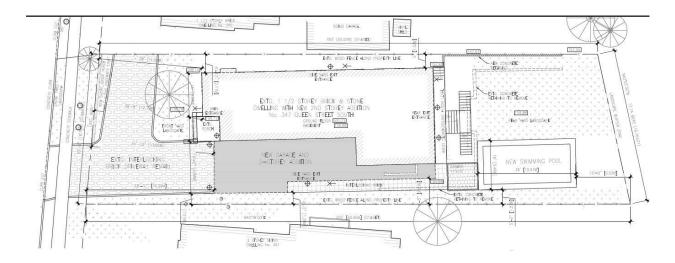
Landscaping details, 347 Queen Street South. (drawing by client, Feb. 2021.)
